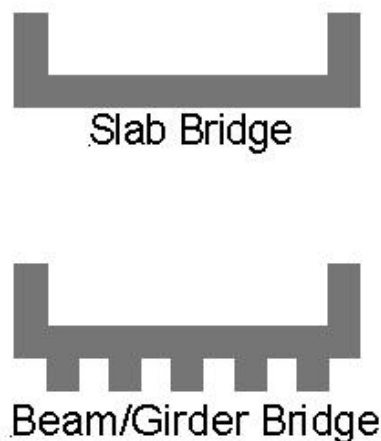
Slab, Beam, and Girder Bridges, in Section
